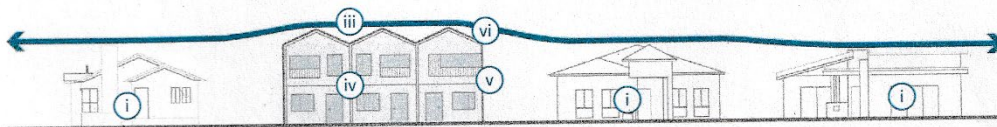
New development can propose an increased height while retaining the prominent building form and rhythm.
